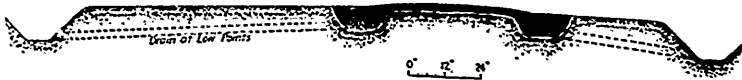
CROSS-SECTION OF STEEL RAIL HIGHWAY, DESIGNED BY THE OFFICE OF ROAD INQUIRY, U. S. DEPARTMENT OF AGRICULTURE.
